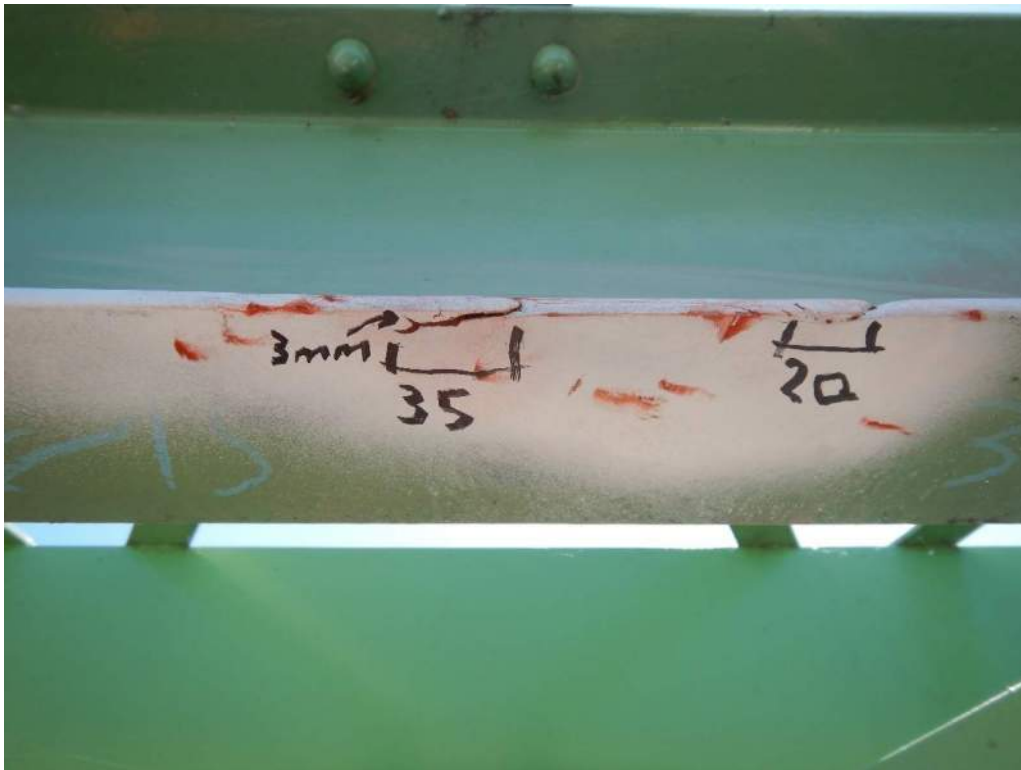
A 20mm crack, and a 3mm crack propagating from a 35mm crack on the north side of the bottom web of top chord member 1S-3S (bottom of web).
